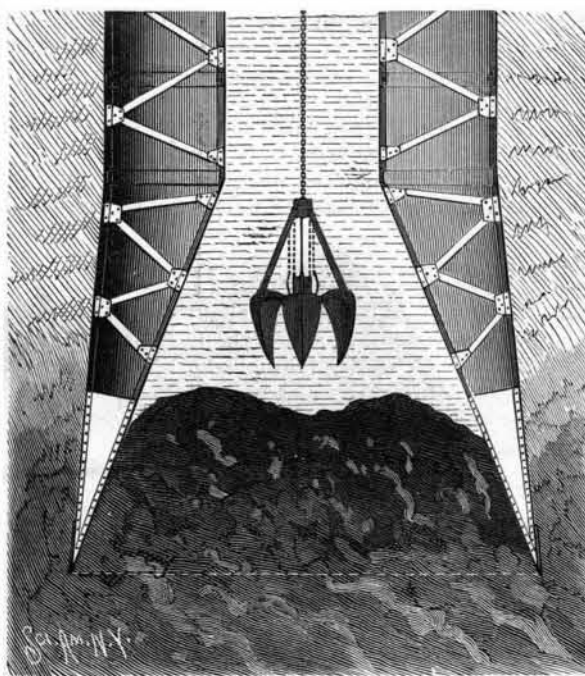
ENLARGED VIEW OF BOTTOM OF PIER.
